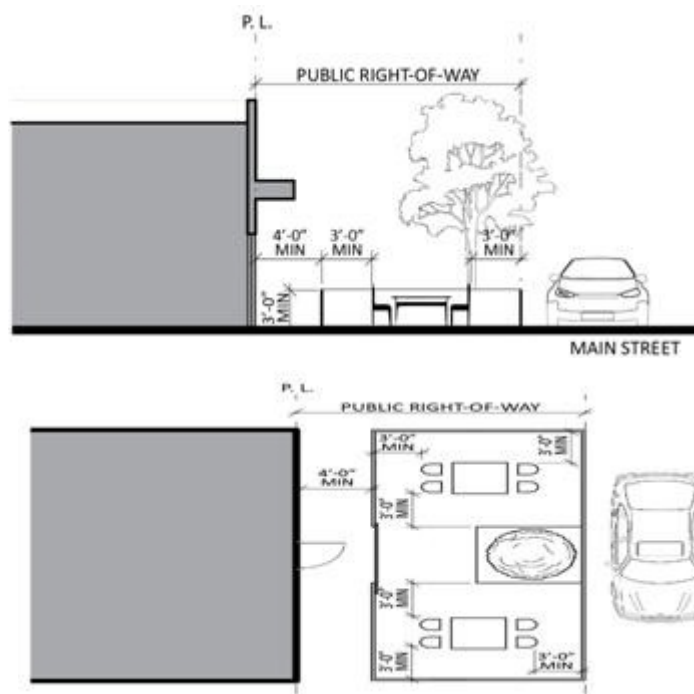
Example of an outdoor dining area in the public right-of-way with a barrier.
